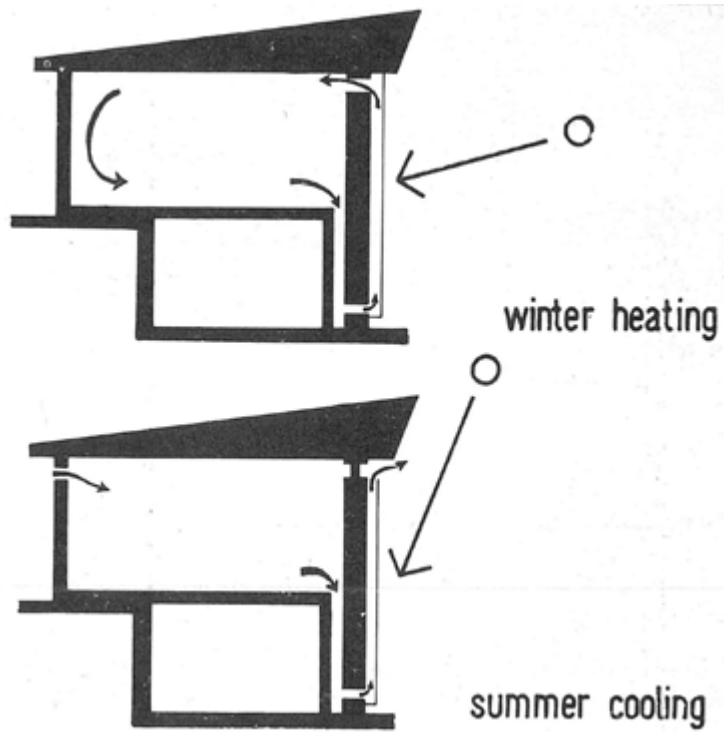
Trombe Wall, Winter heating and summer cooling. Section of the detached house with Trombe Wall, built in 1967 in Odeillo, France. (Architectural Design, 1/1975)
